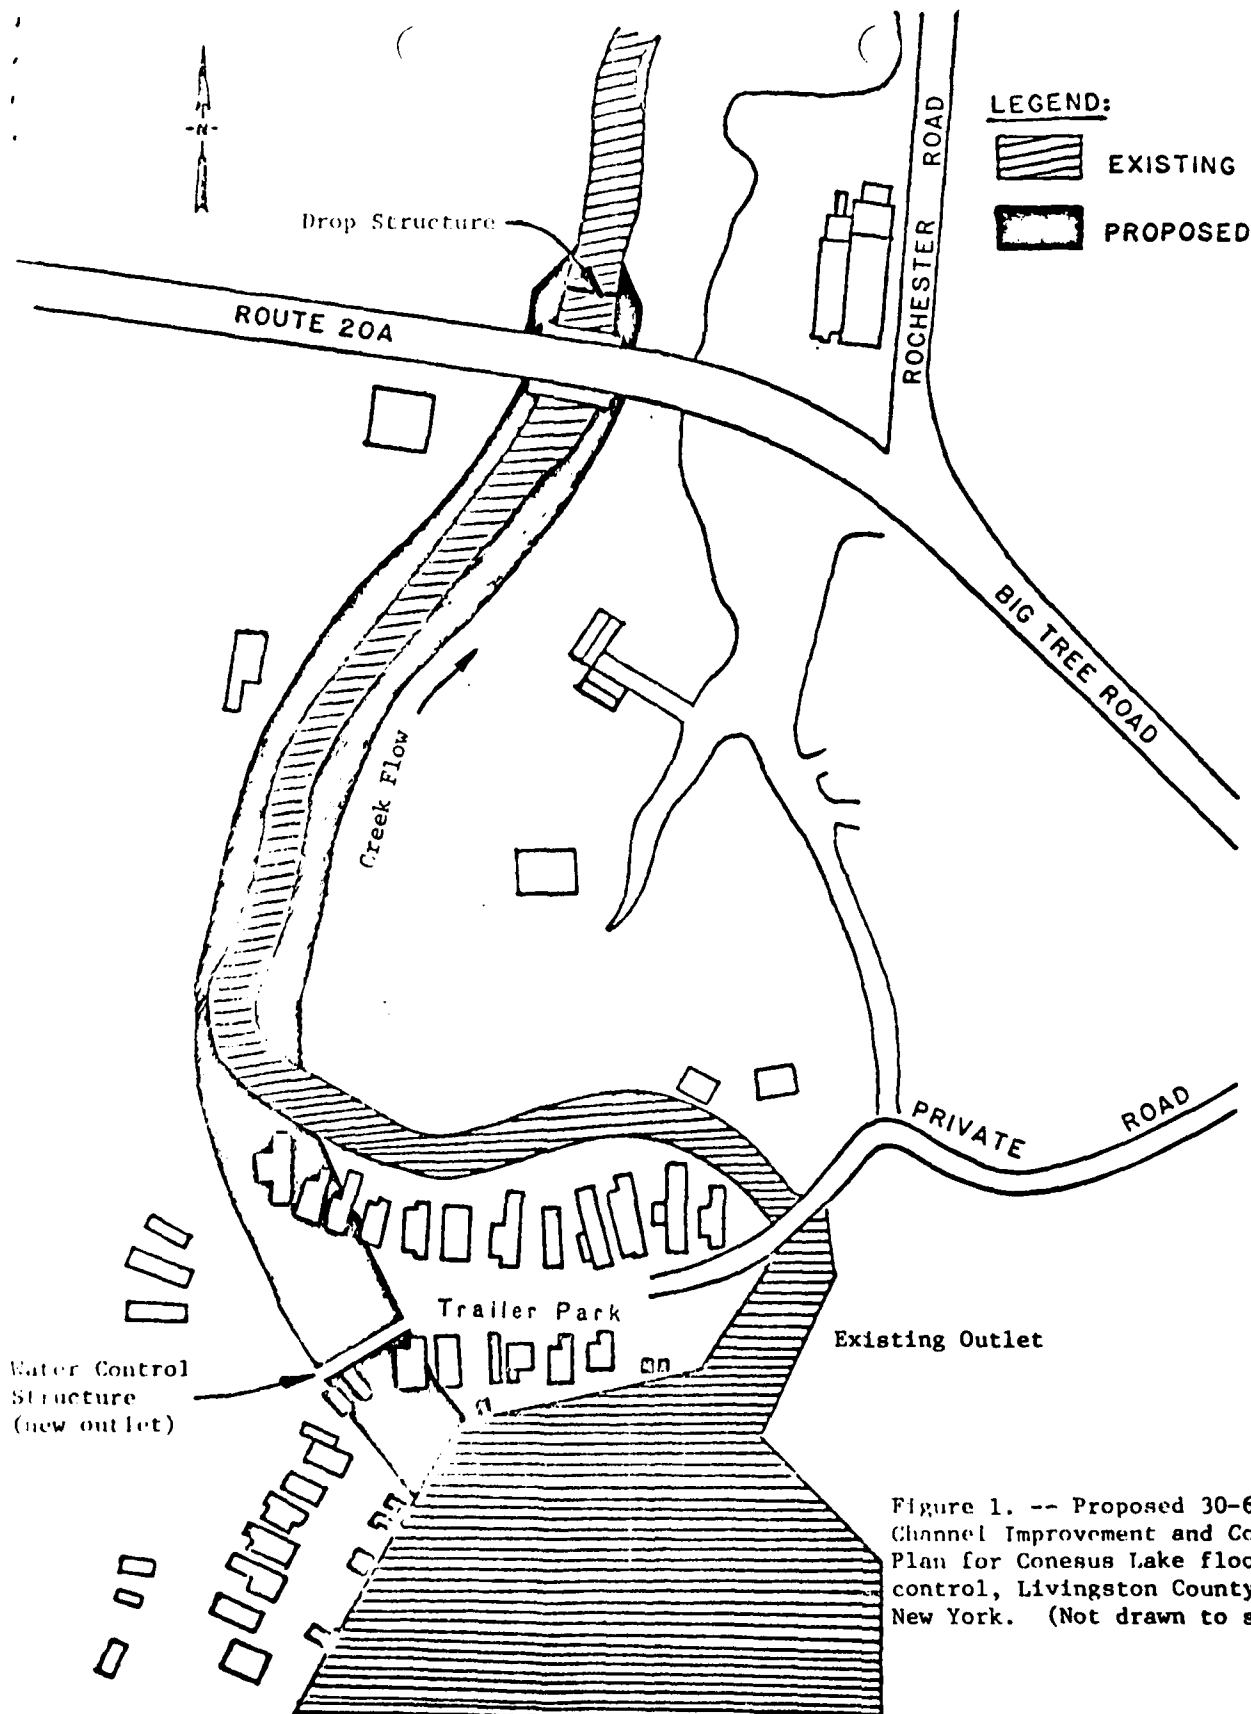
Proposed 30-60 Channel Improvement and Control Plan for Coney Lake flood control, Livingston County, New York. (Not drawn to scale)
